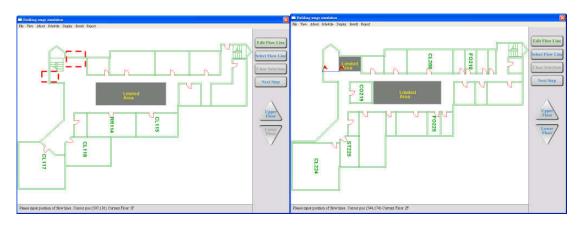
Plan B—(a) 1F space layout, (b) 2F space layout.
